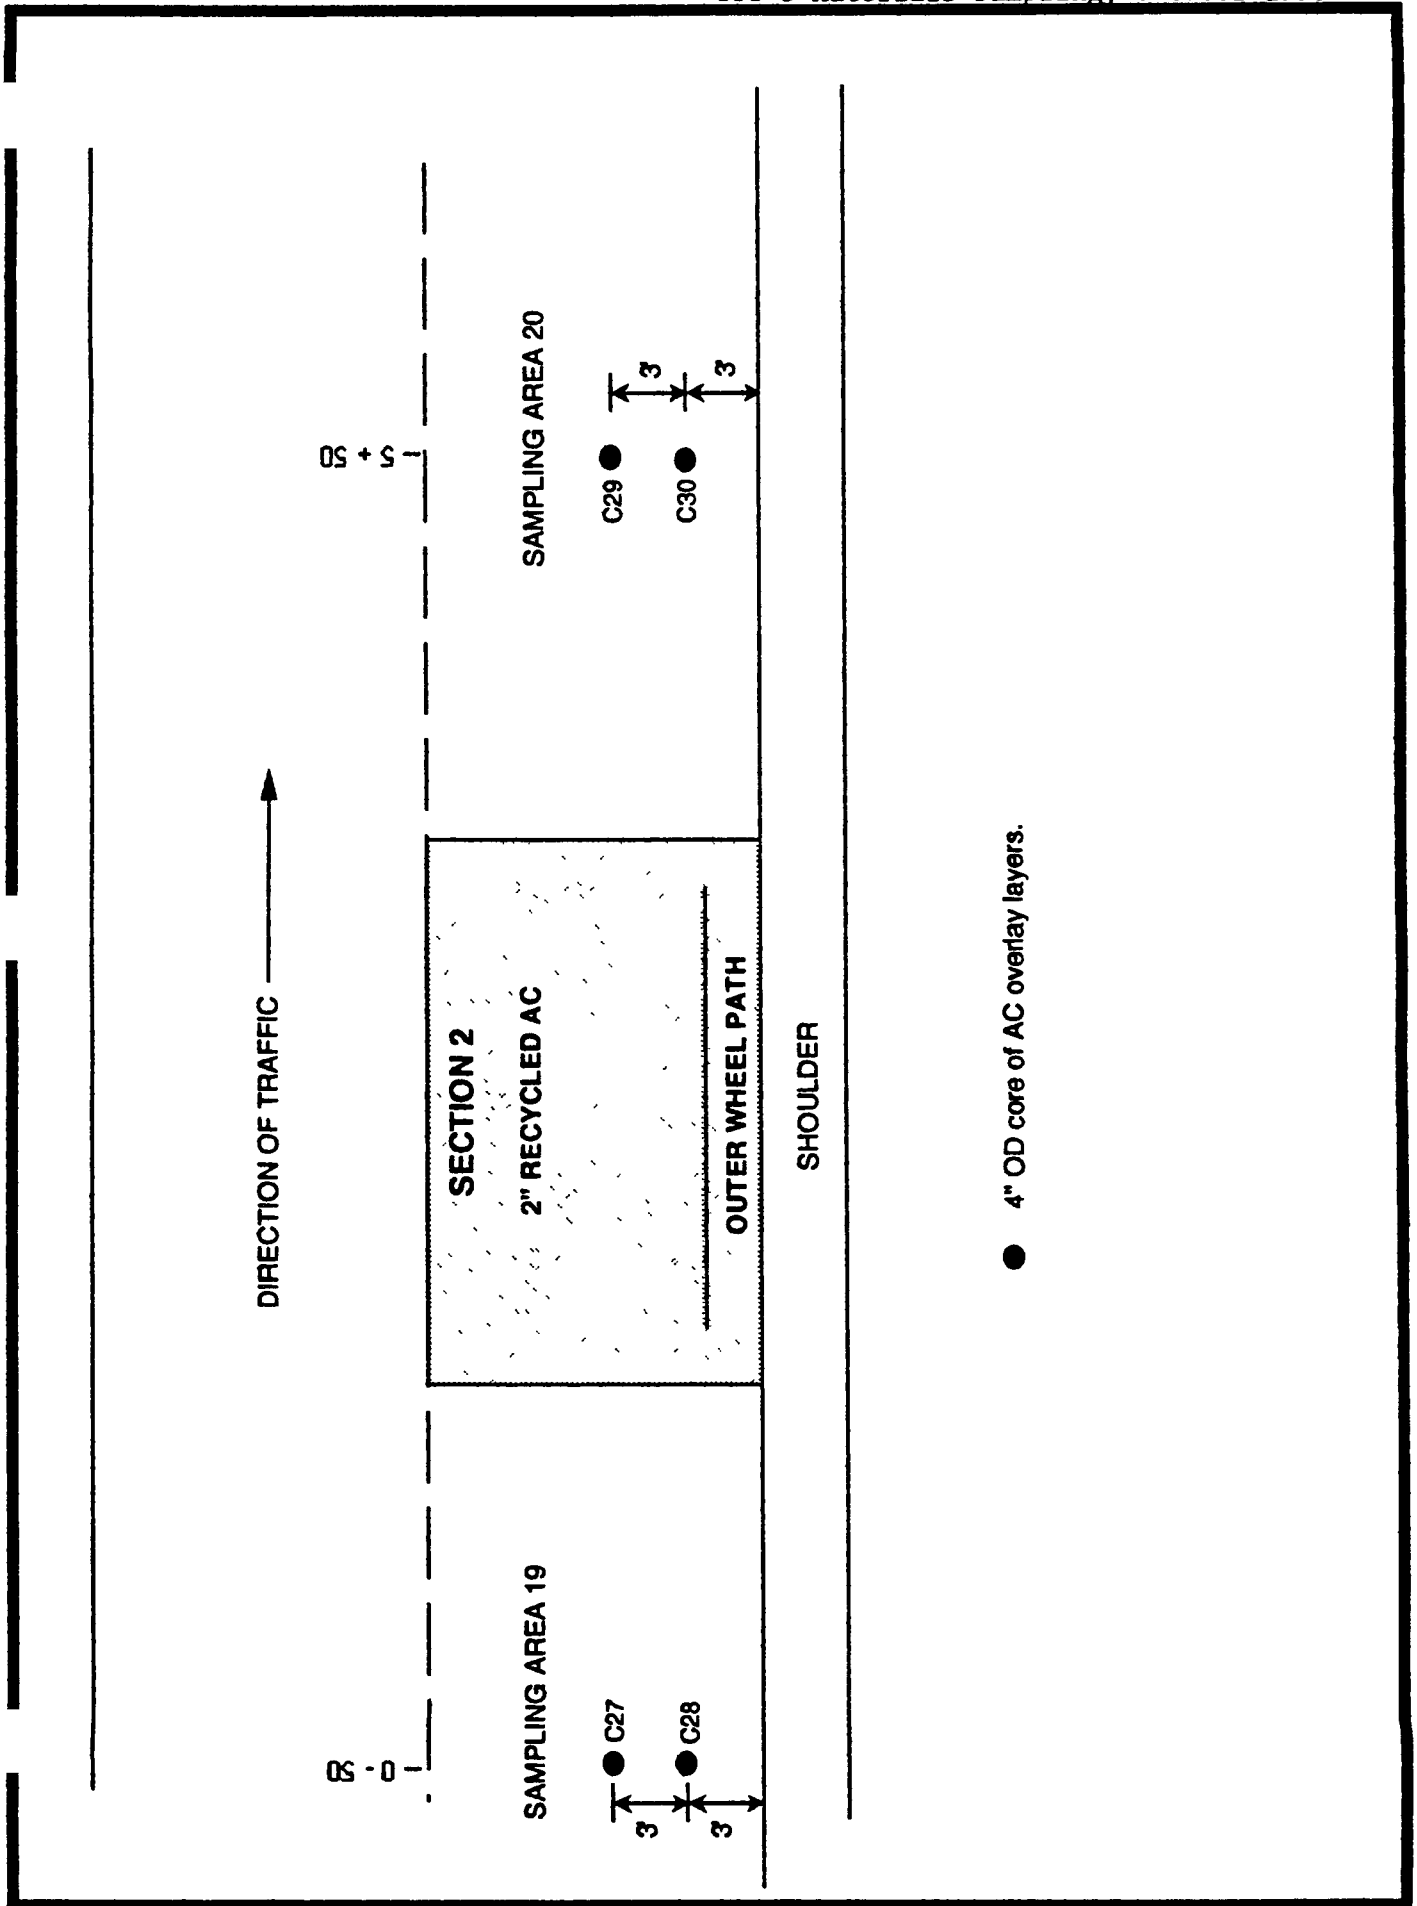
Example of "Post-Construction" Sampling Plan for Section 2.
